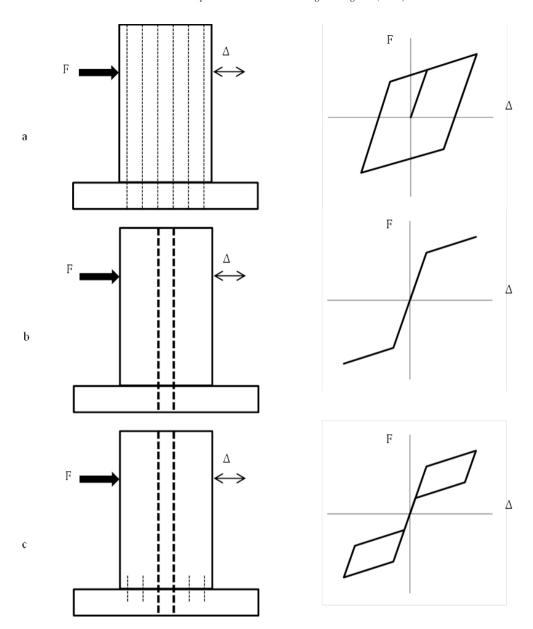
(a) conventional cast-in-place wall; (b) unbonded post-tensioned wall; (c) unbonded post-tensioned hybrid wall.
